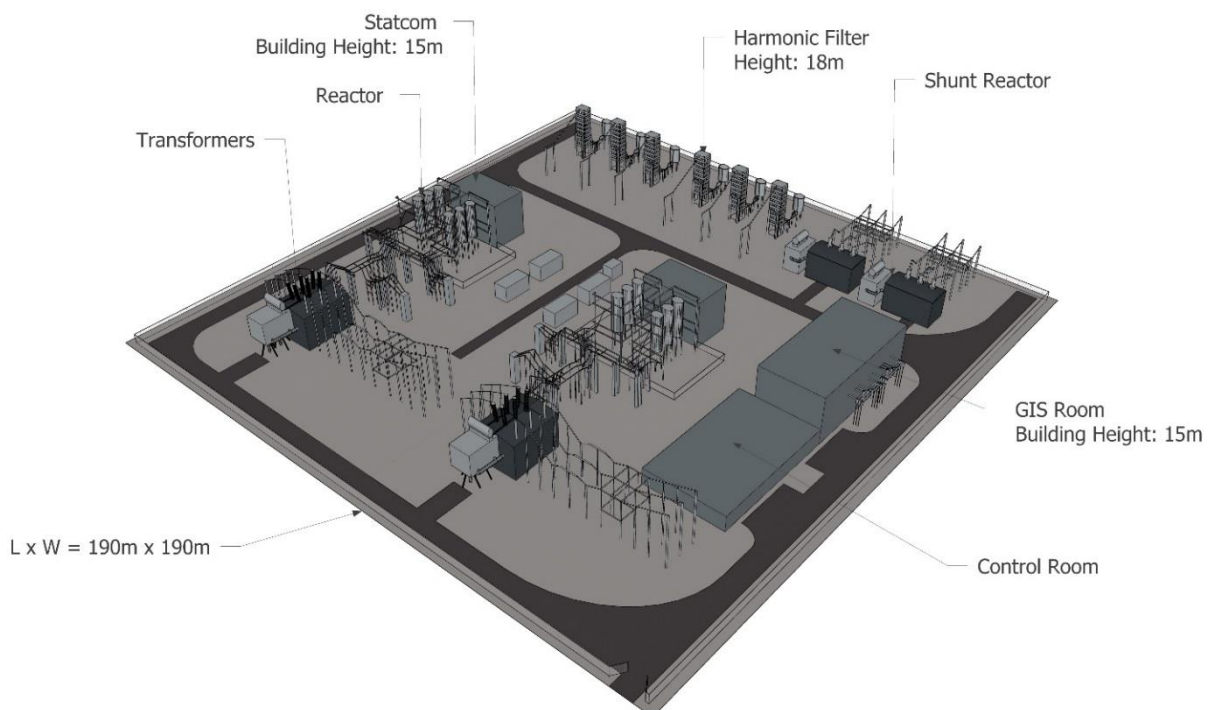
Rochdale Envelope 3D model of East Anglia ONE North onshore substation
